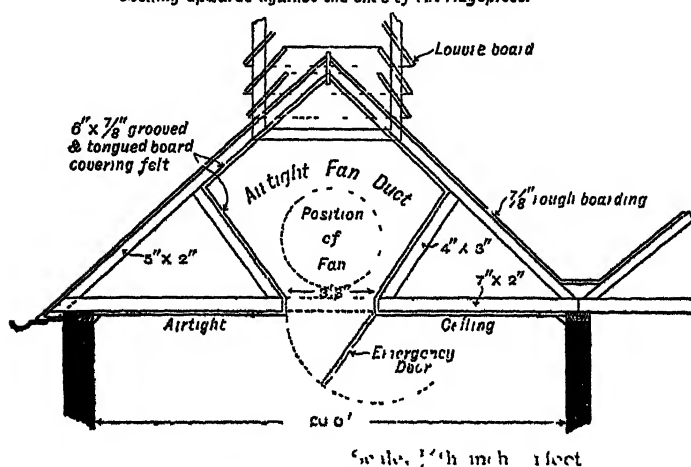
Cross section of air-tight duct in roof of kiln No. 1.
